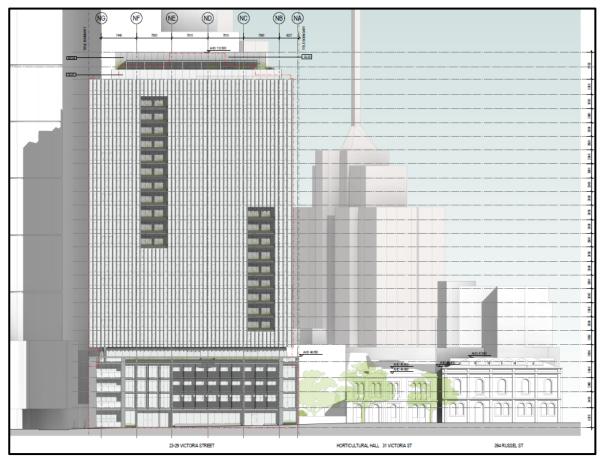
Excerpt from North Elevation (Victoria Street) (S.57A Amended Plans)
